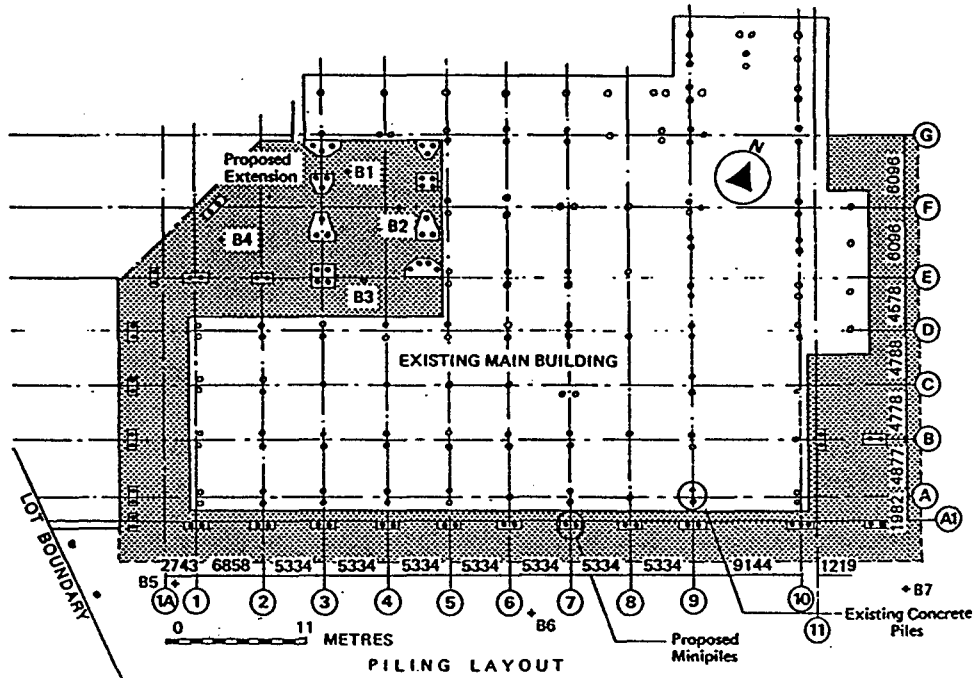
Plan showing the extension of the club's main building, Hong Kong Country Club (Bruce and Yeung, 1983).
